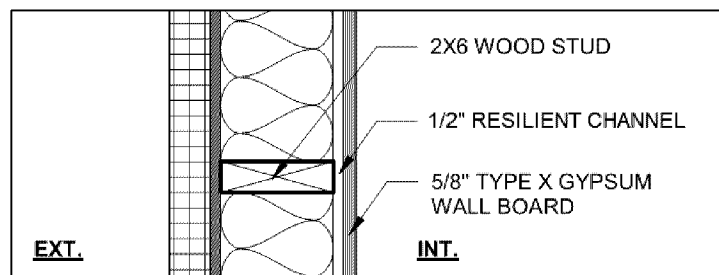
Detail of the guest room exterior wall with resilient channel.
